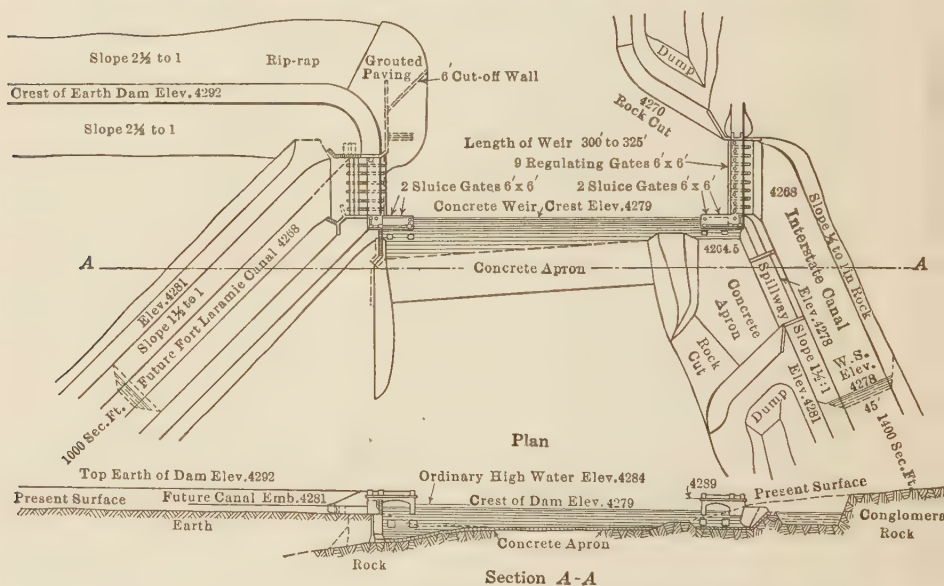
General plan of diversion dam on North Platte River and headworks for Interstate Canal. North Platte Project, Neb.-Wyo.
